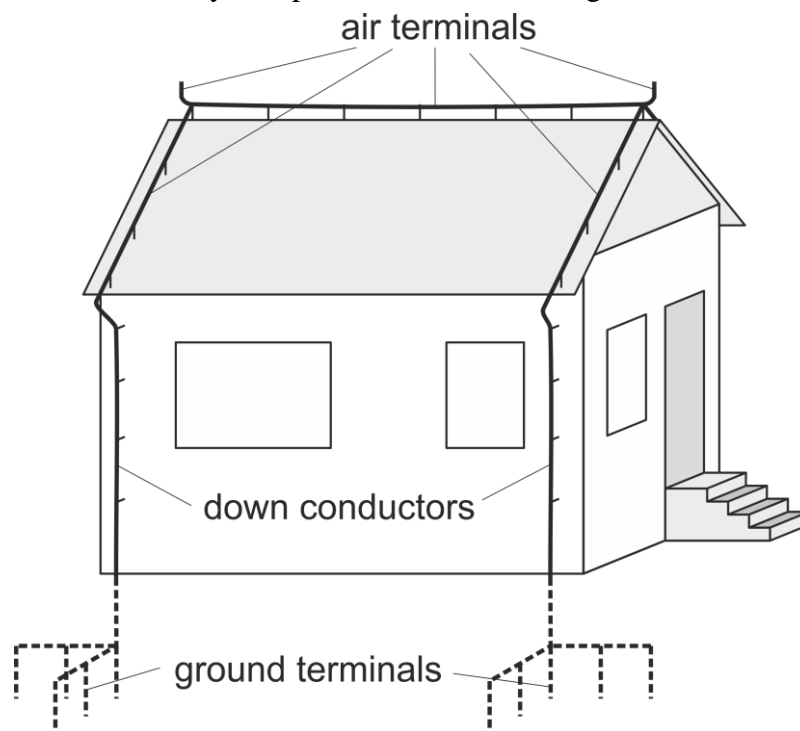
Scheme of construction of the light protection system (LPS): example – single-family building [19]
